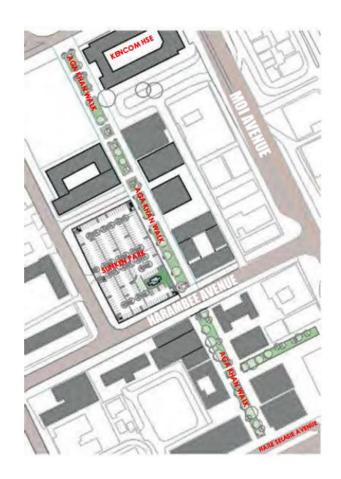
Plan drawing of Aga Khan Walk from City Hall Way to Haile Selassie Avenue.
